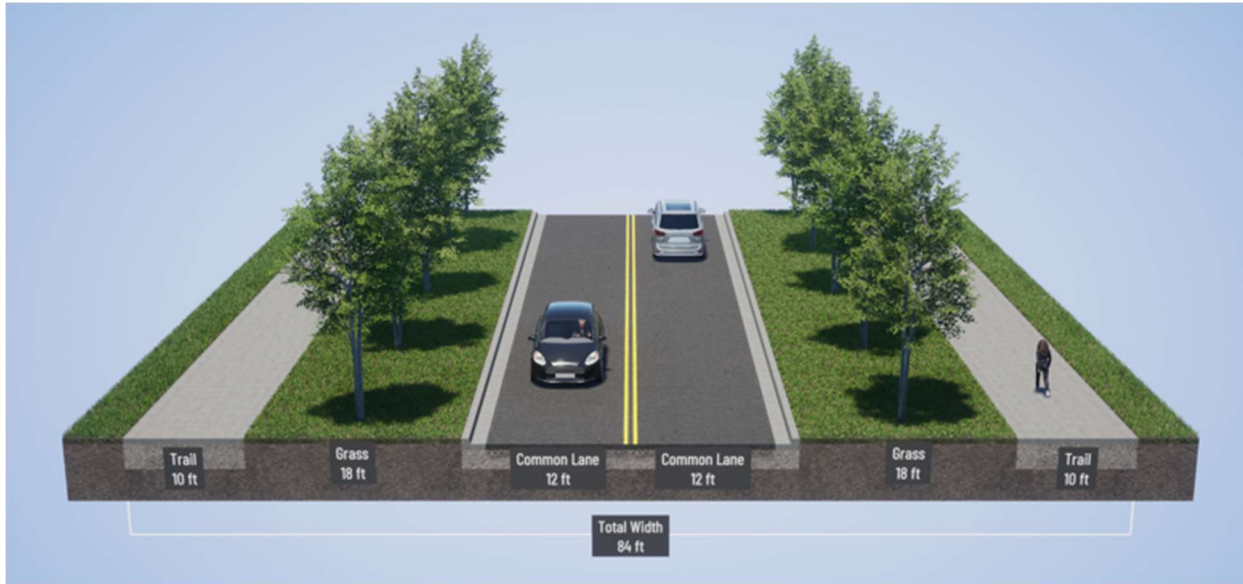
Mixed Use Arterial Typical Section, Extended Boulevard
